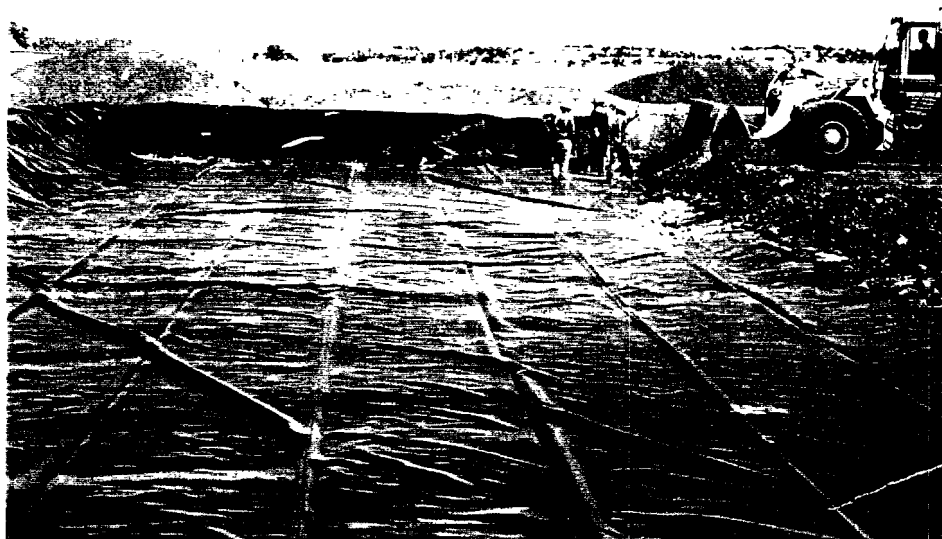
Installation of HDPE Liner in Run-off Collection Basin
